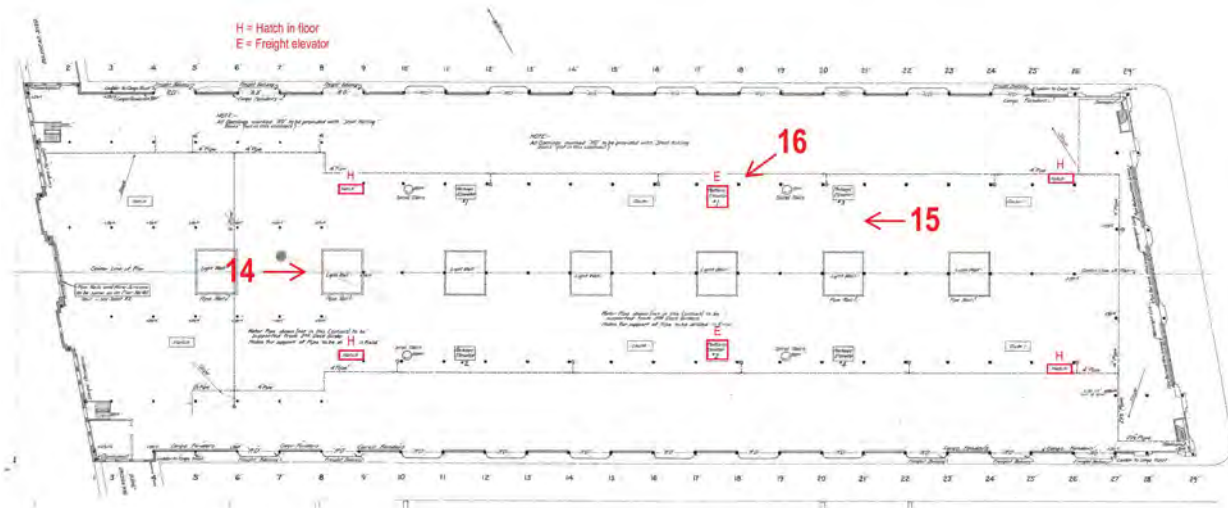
Pier 38 – Plan of second floor with photo key. This plan is taken from the original set of construction drawings and, with the exception of some missing equipment, accurately represents the existing conditions. The remaining elevators and hatches are noted.
